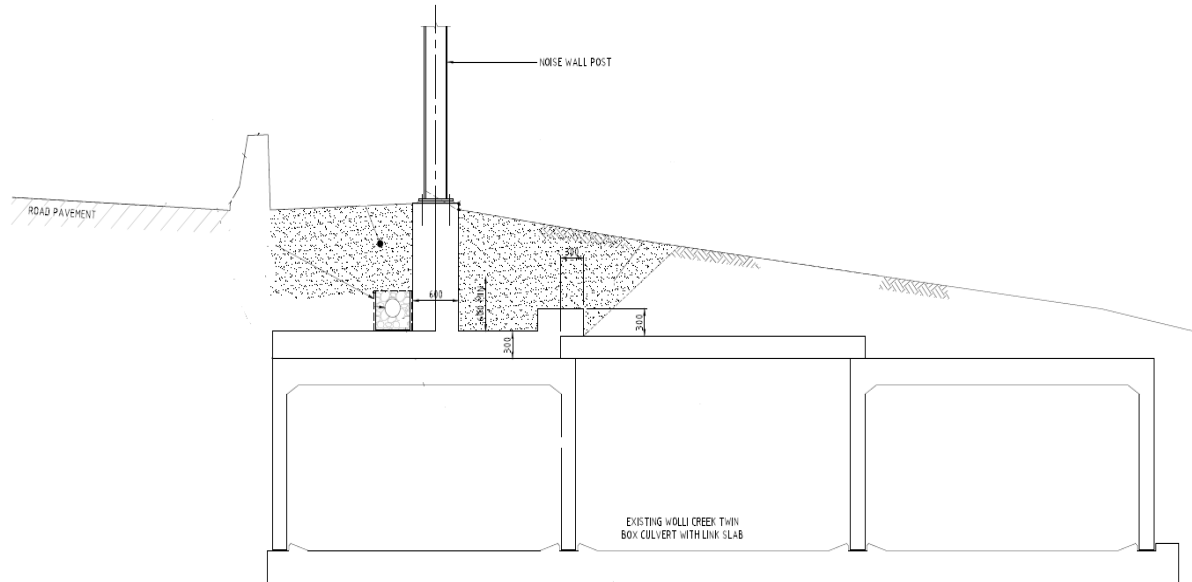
Noise Wall 2 (Figure 1 cross section – NW2 – XS2)
